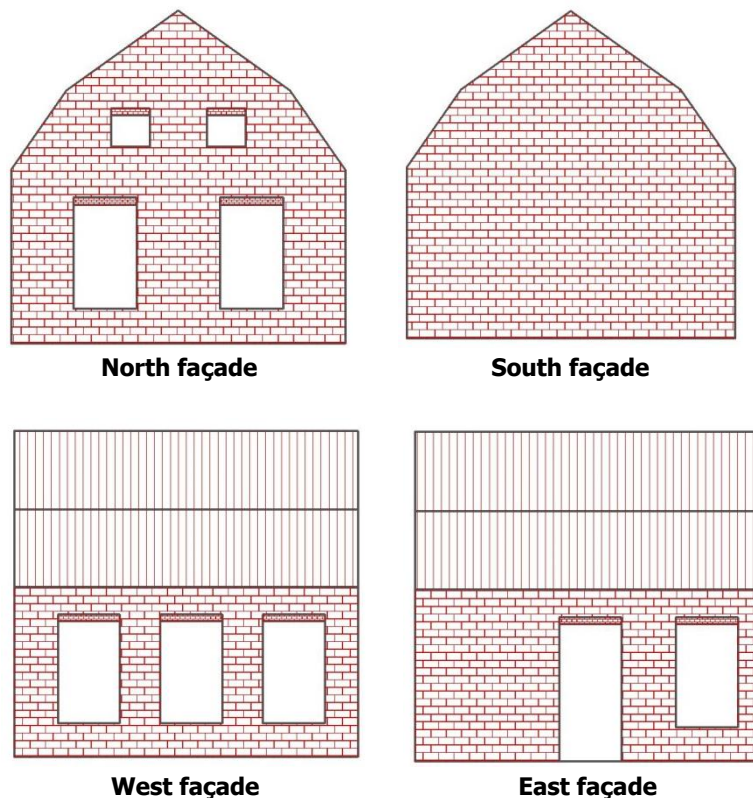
Layout of the façades of reference building LNEC-BUILD-3, as studied in the current work
